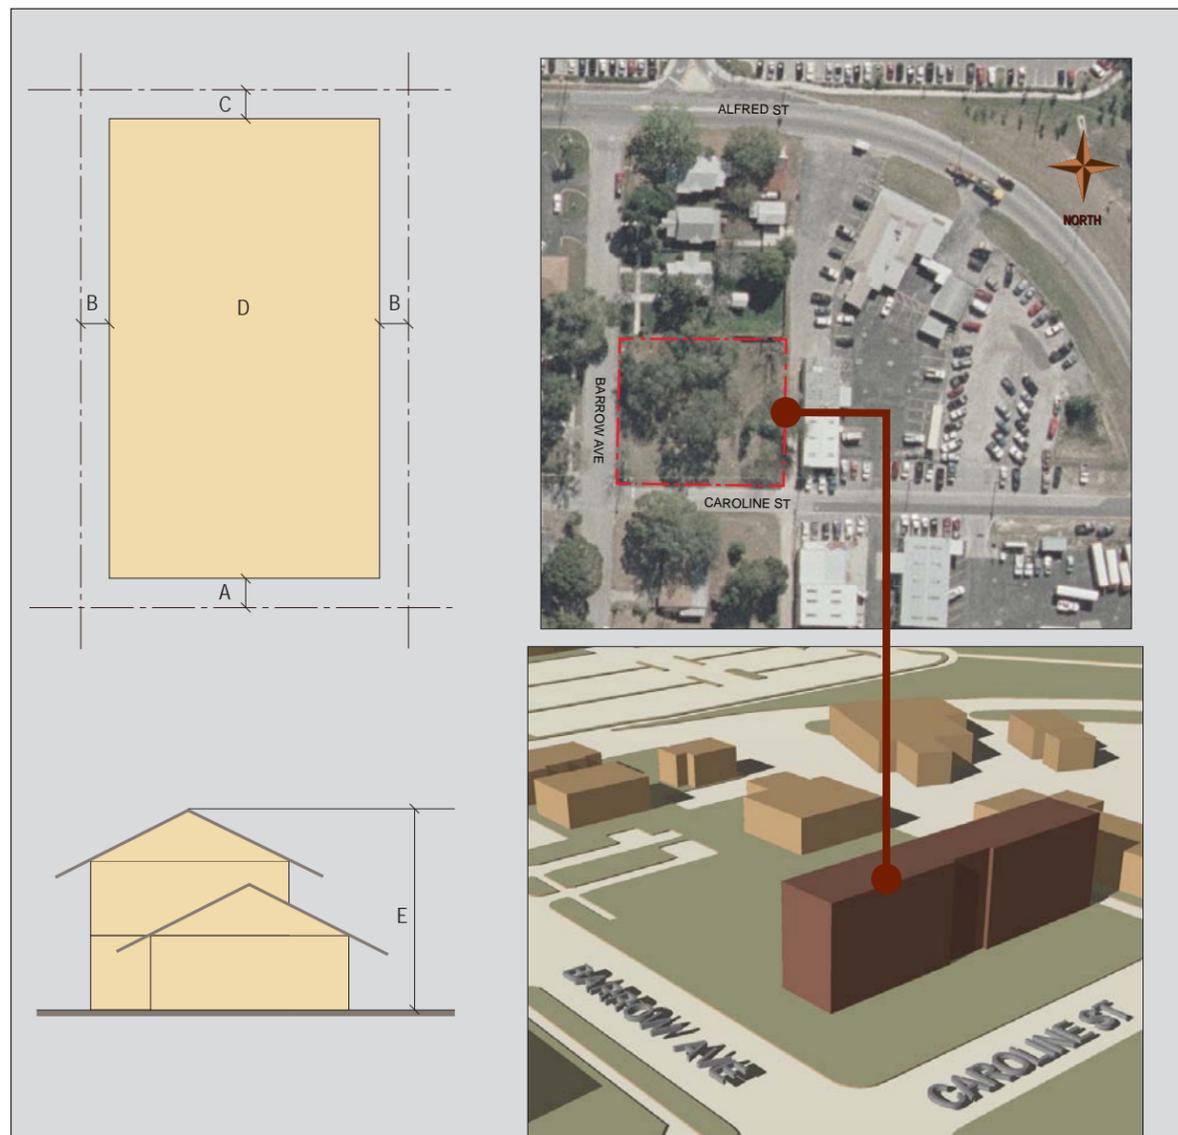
Build-out under existing zoning regulations: Vacant parcel located at the northwest intersection of Barrow Avenue and Caroline Street (Bottom). (Top) Aerial view of vacant parcel: northwest intersection of Barrow Avenue and Caroline Street.
